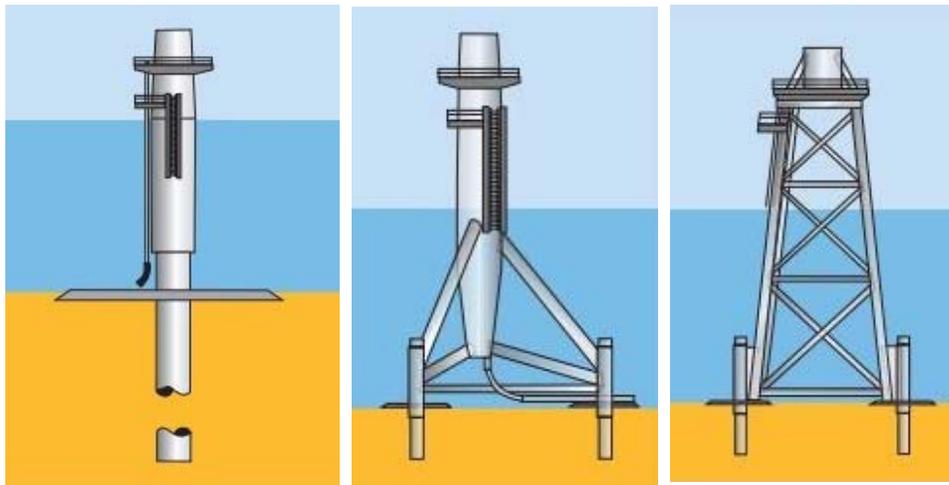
Monopile, Tripod and Jacket Foundation [Source: EWEA]
